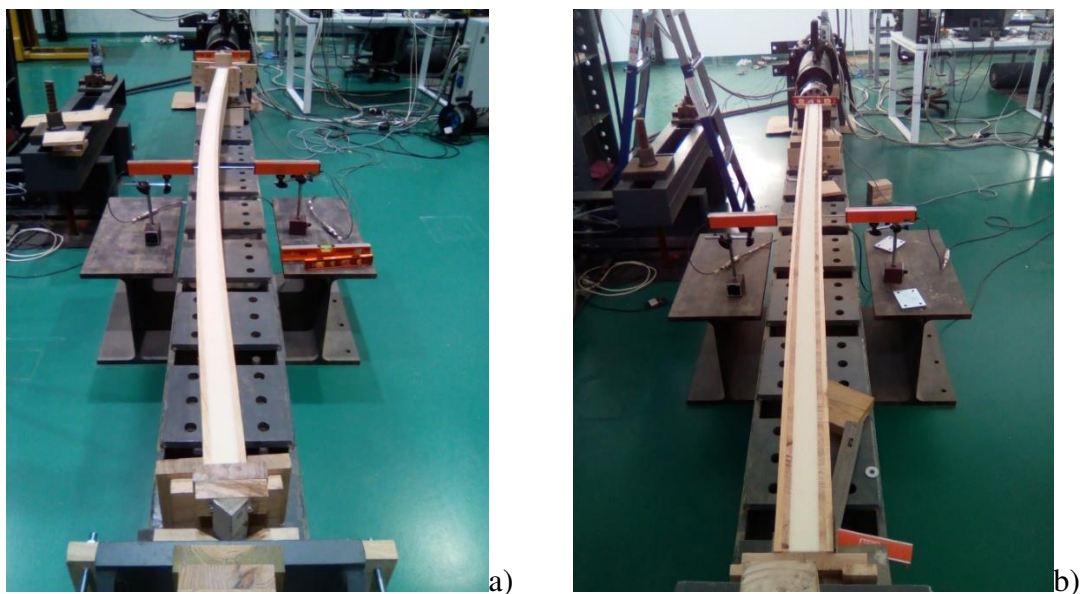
Buckling test of: a) SIP specimen; b) CIT specimen.
